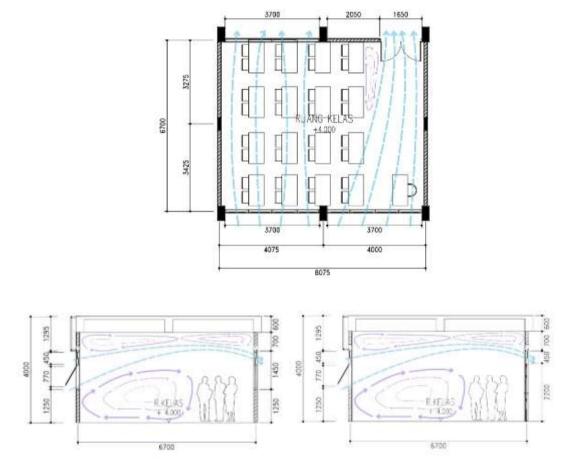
Plan and Section of The Changes in Cross-Ventilation Wind Movement (Source by Author, 2024)
